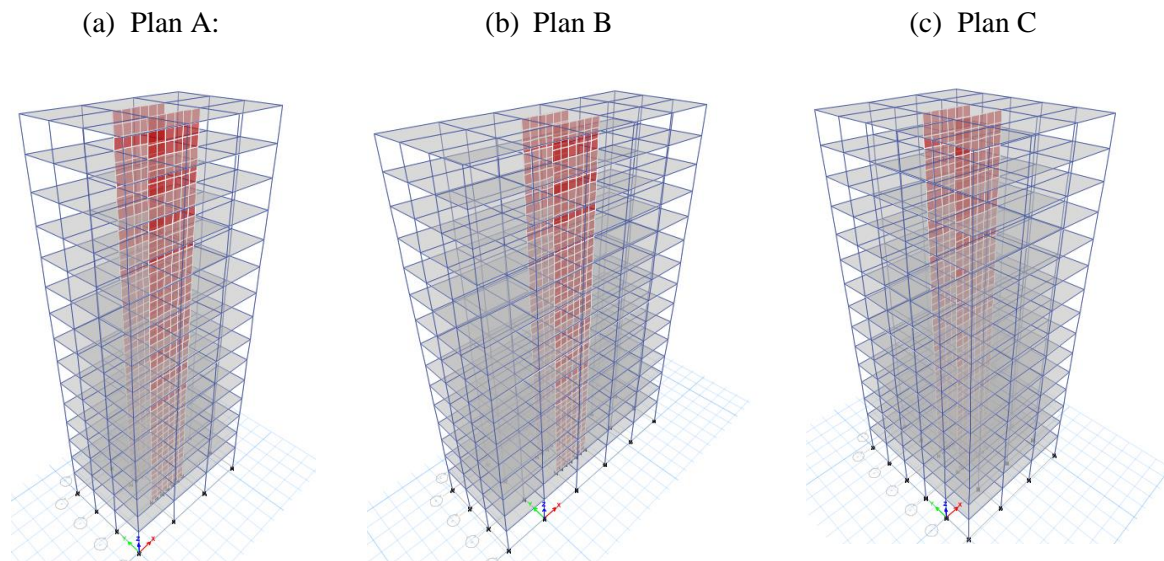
3D building models of plan A (a), plan B (b) and plan C (c) - 15-storied building
